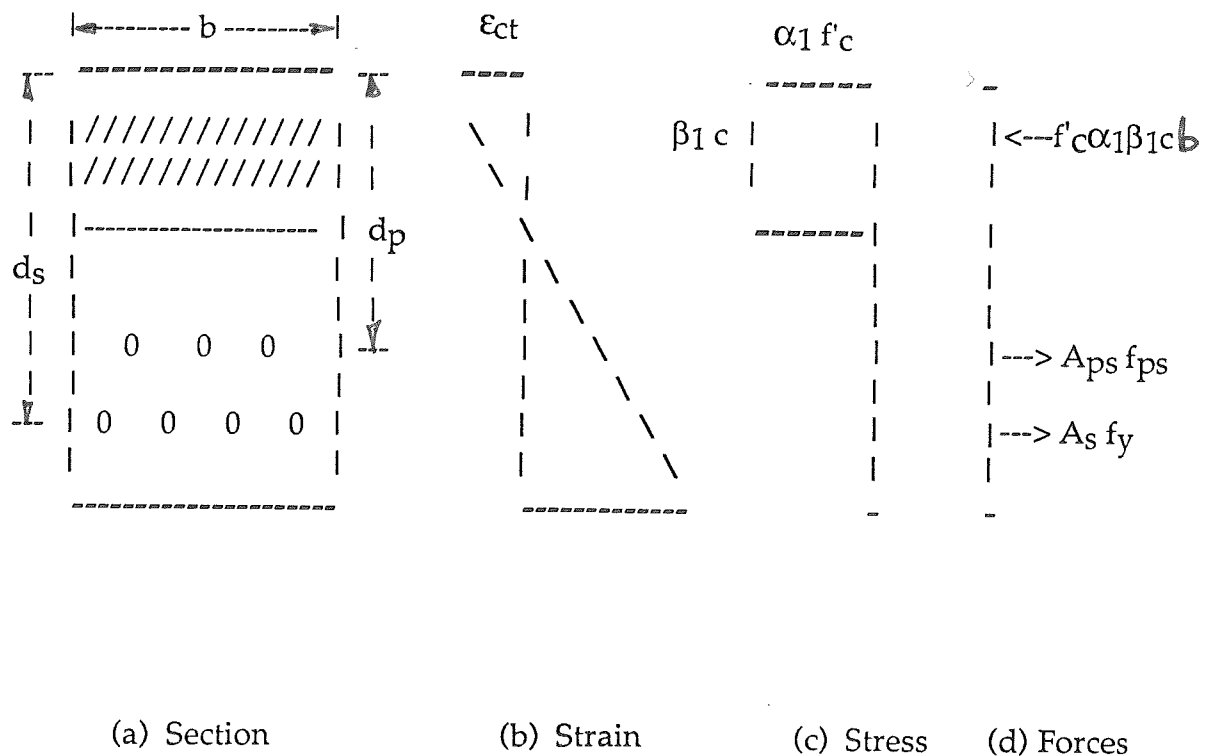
Section, strain, stress and component forces diagrams of a typical unbonded concrete section with bonded steel.
